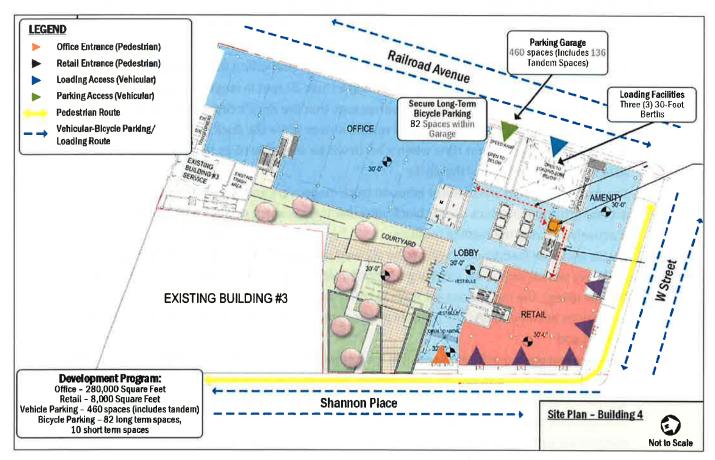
Site Access and Circulation (Source: CTR, Gorove/Slade, Figure 8, 6/11/18)
